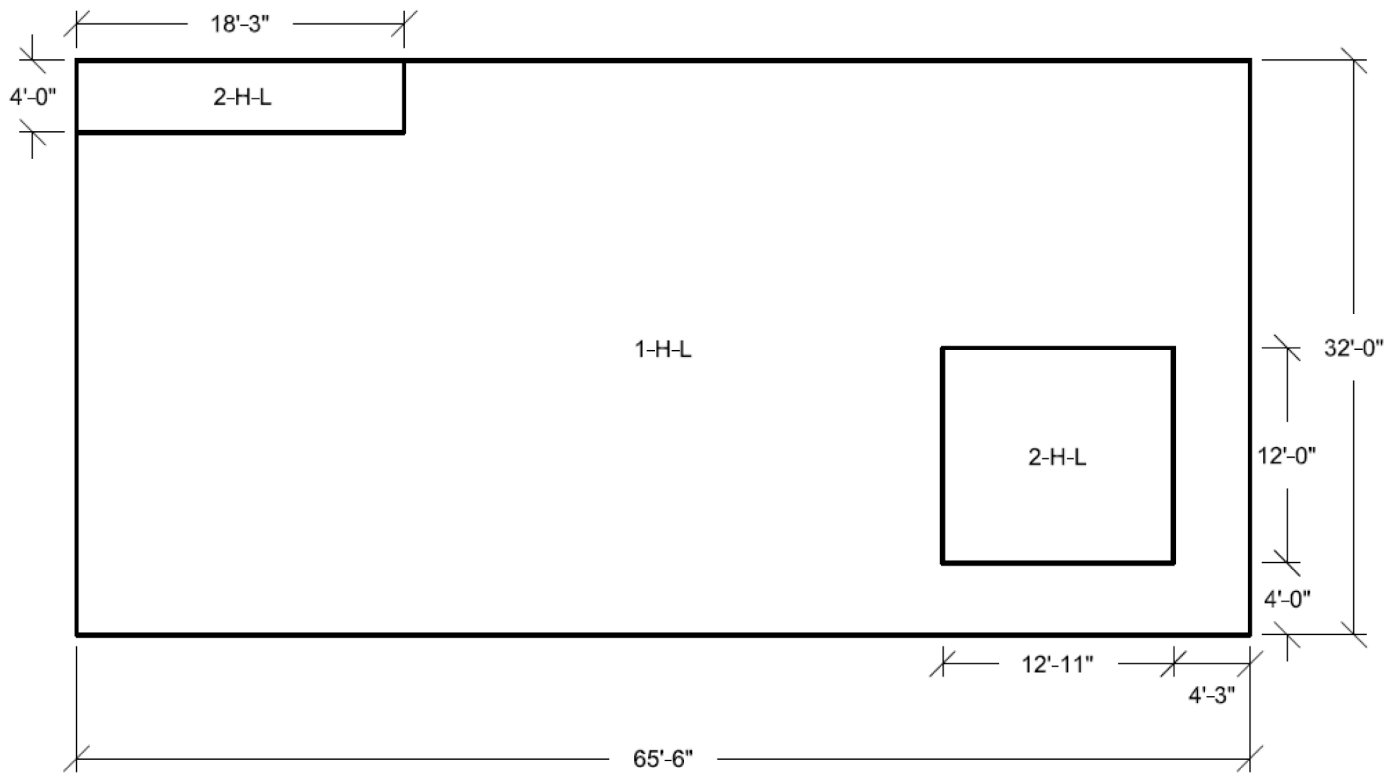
H.6-170 DGFOV Wall 8 Looking From Outside Horizontal Reinforcement Zones Far Side Face
